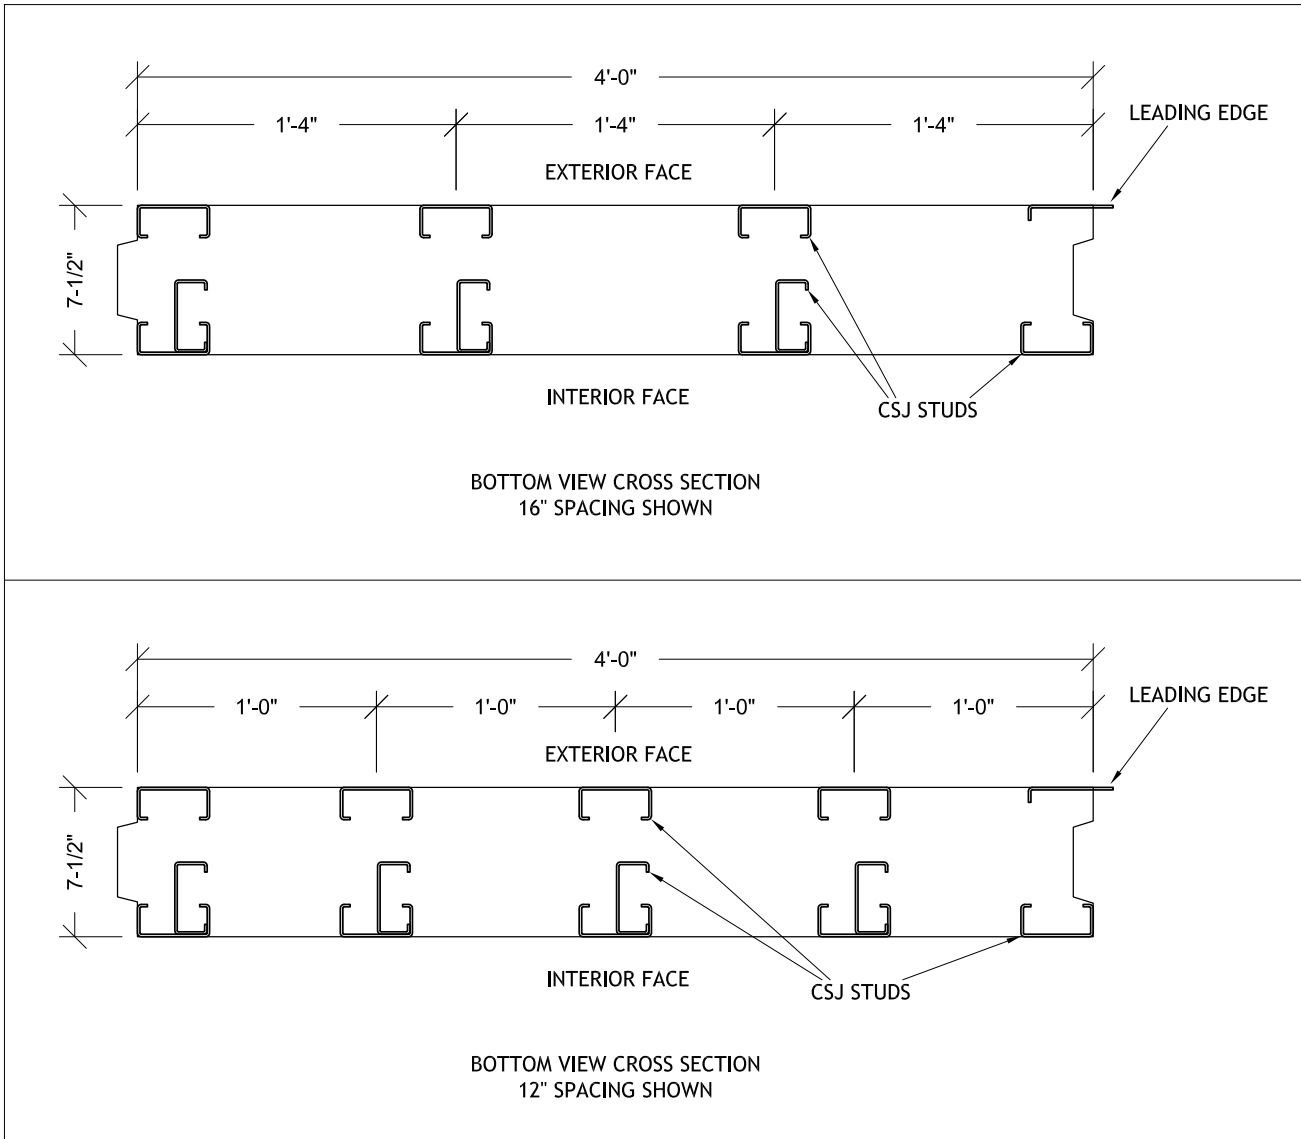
BELOW GRADE WALL SECTION WITH C600 STUDS EVERY 16 OR 12 INCH ON CENTER
